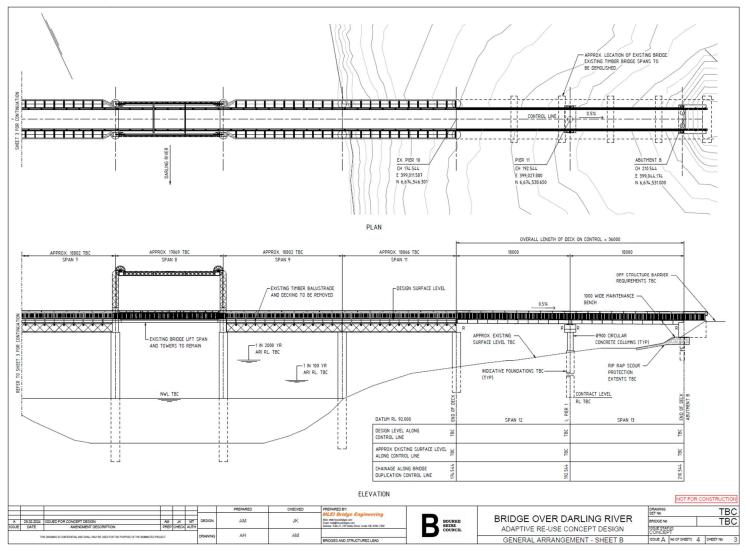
Eastern approach and elevation Source: MLEI Bridge Engineering
